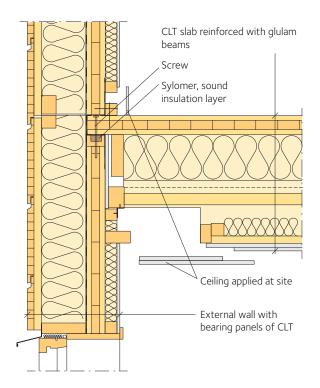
Vertical section for building with high requirements, regarding sound insulation. Joint flooring and external wall.
